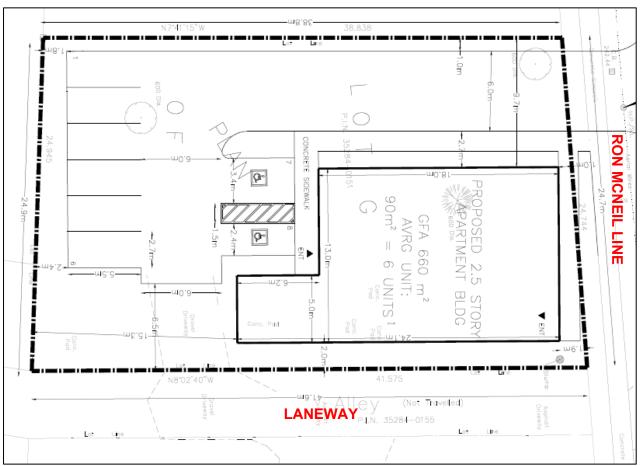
Conceptual Site Plan (excerpt), Option 3 access
